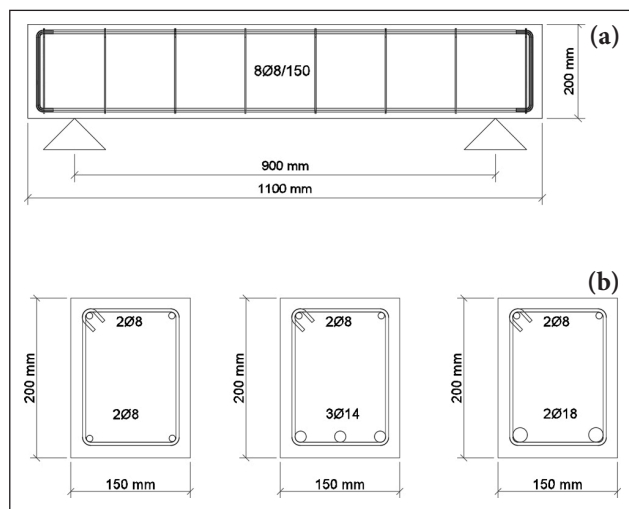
(a) Beam longitudinal section and transverse reinforcements, (b) Beam cross-sections and longitudinal reinforcements.
